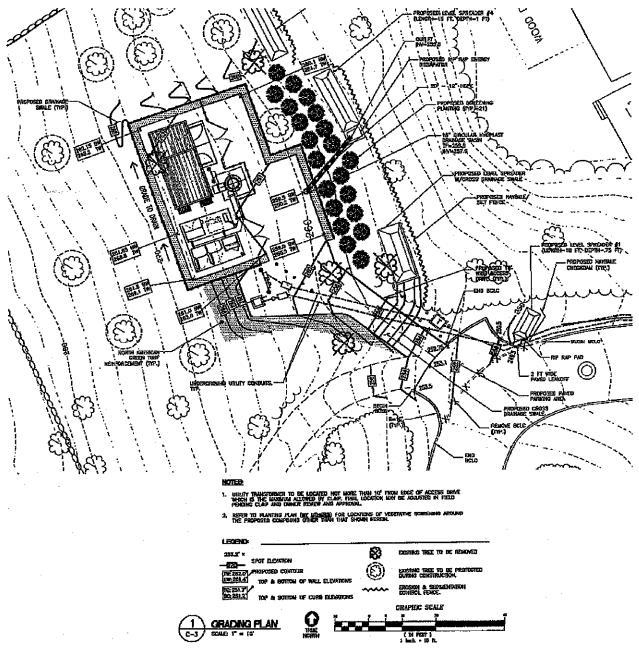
Revised Site plan for the proposed facility at 208 Valley Road in New Canaan. (T-Mobile 7)
